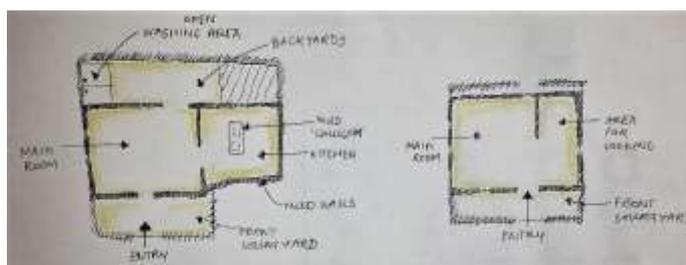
A schematical diagram showing basic plans of mud walled houses around Bairagad
